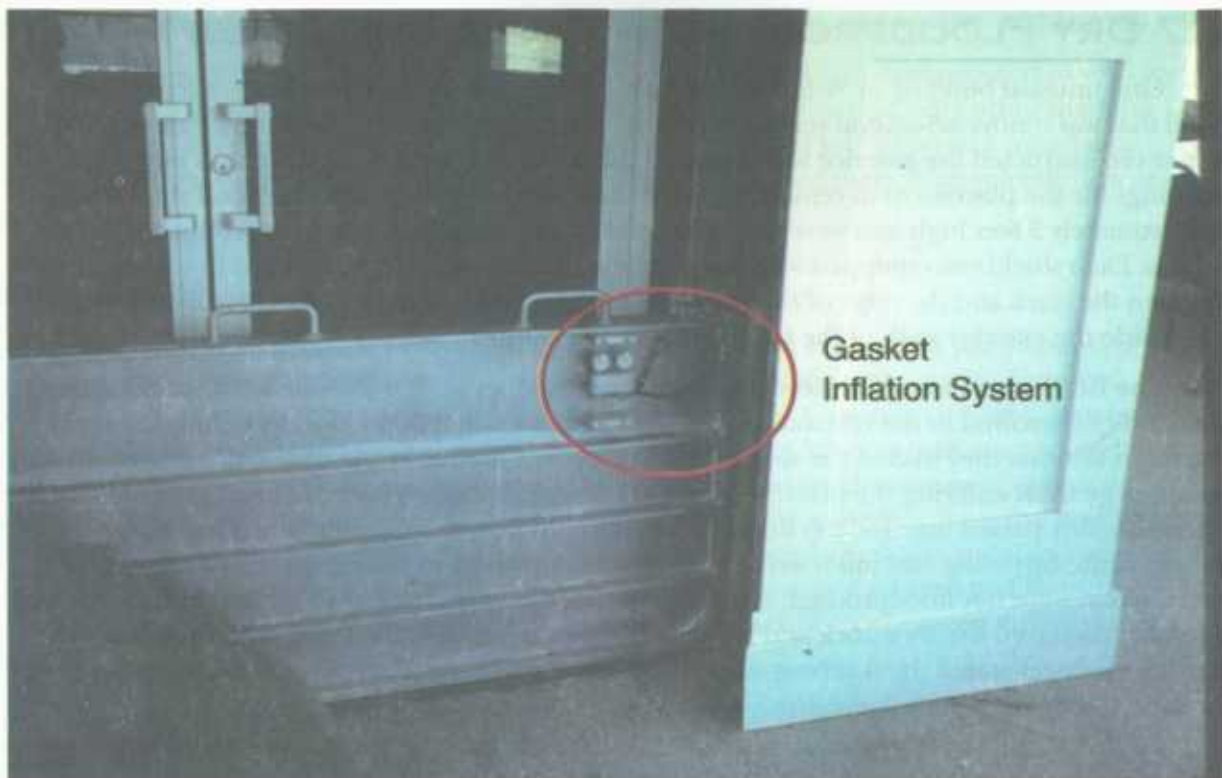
Buildings that are floodproofed require extensive engineering detailing. Note that this flood shield is sealed with a pneumatic gasket.
